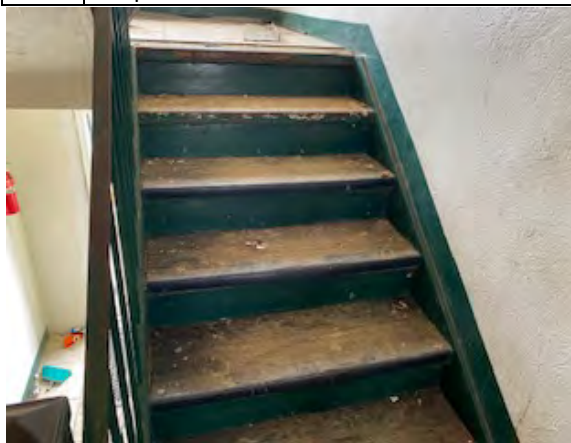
Vinyl Stair Treads & Glue Stairwell Sample Set #16 – Non-ACMs
